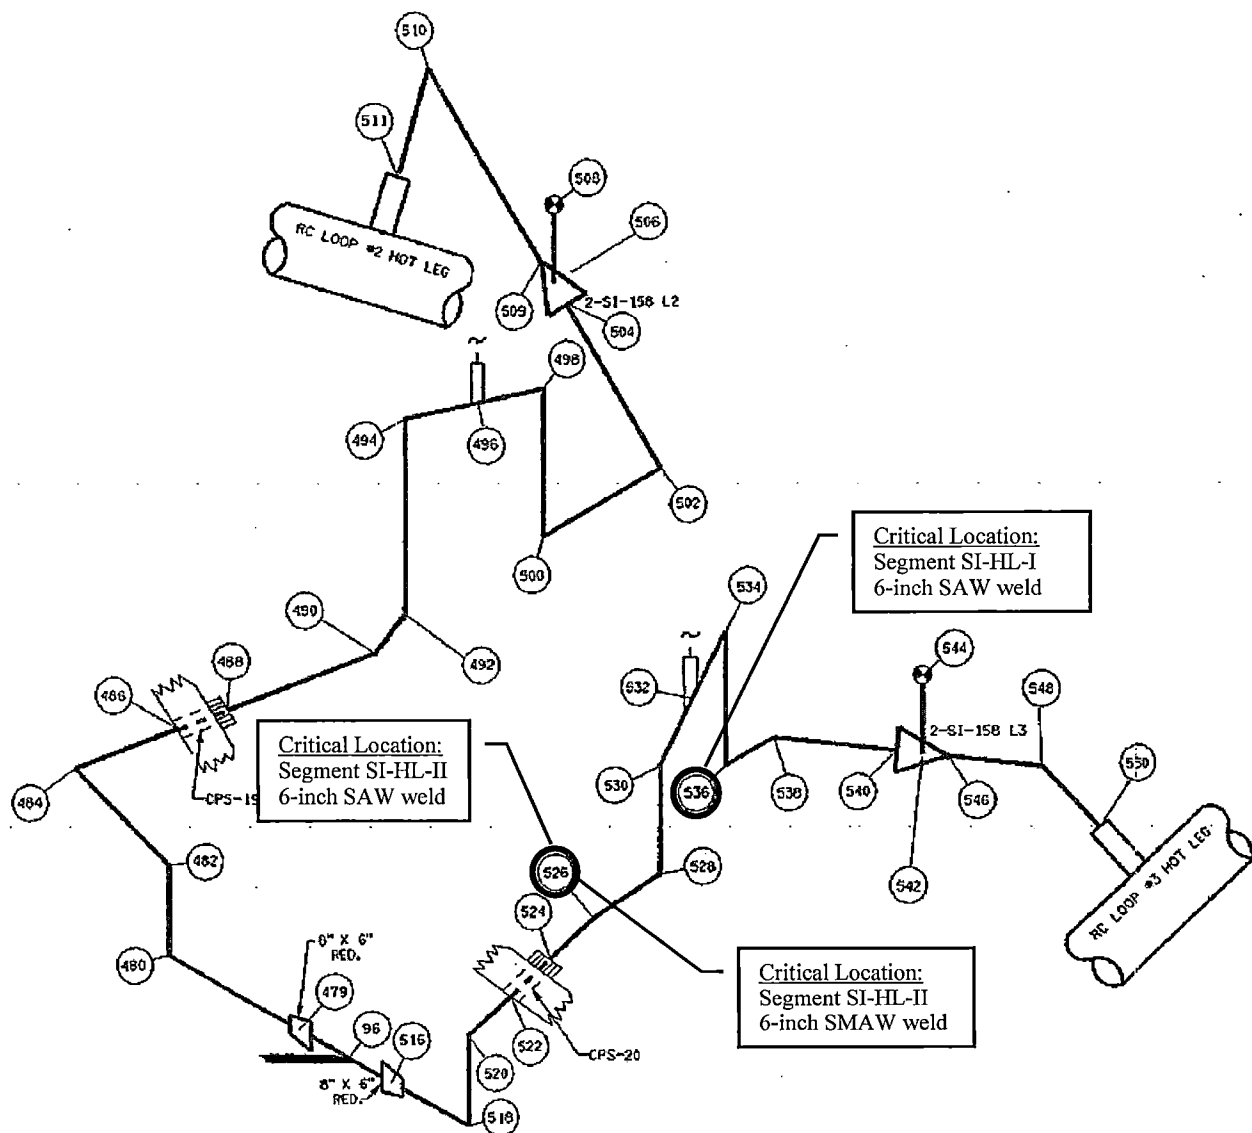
D.C. Cook Unit 2 Hot Leg SI Line Loop 3 Critical Weld Locations
